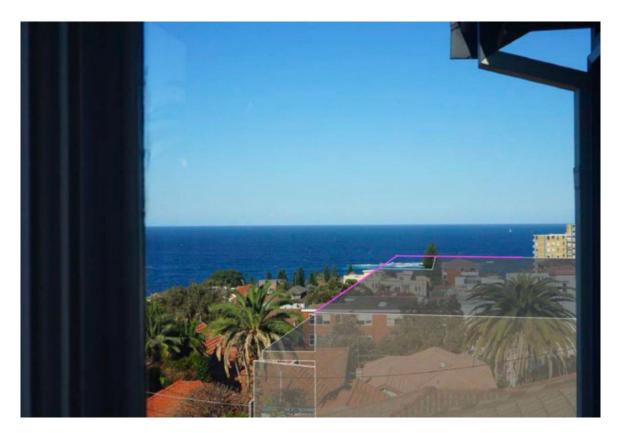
View impact from the upstairs living space with the final version of plans, Revision
